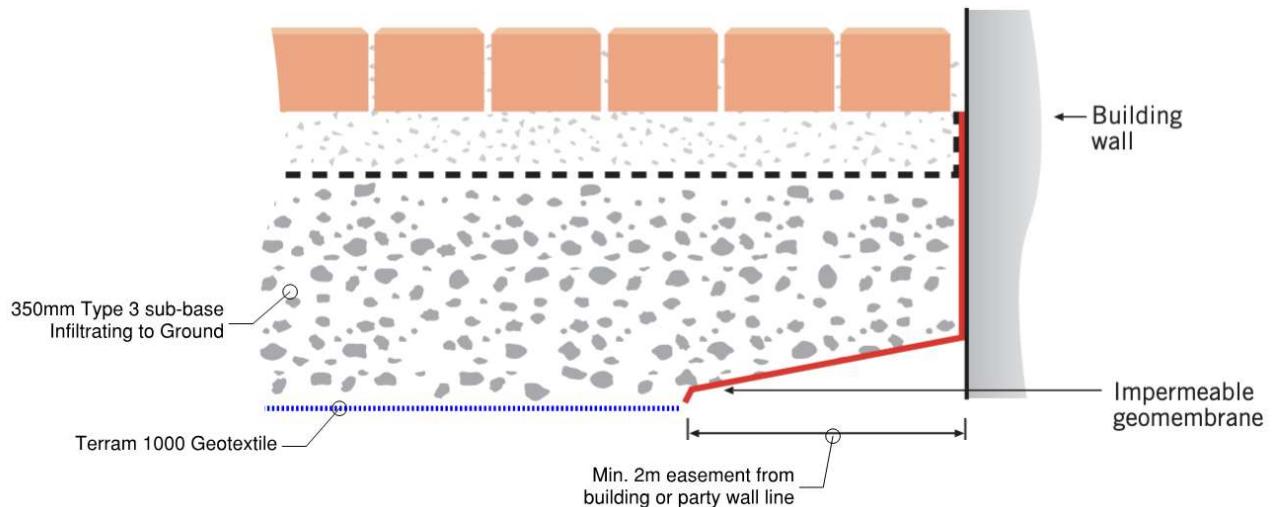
PERMEABLE PAVEMENT USED FOR THE HARDSTANDING AREA
